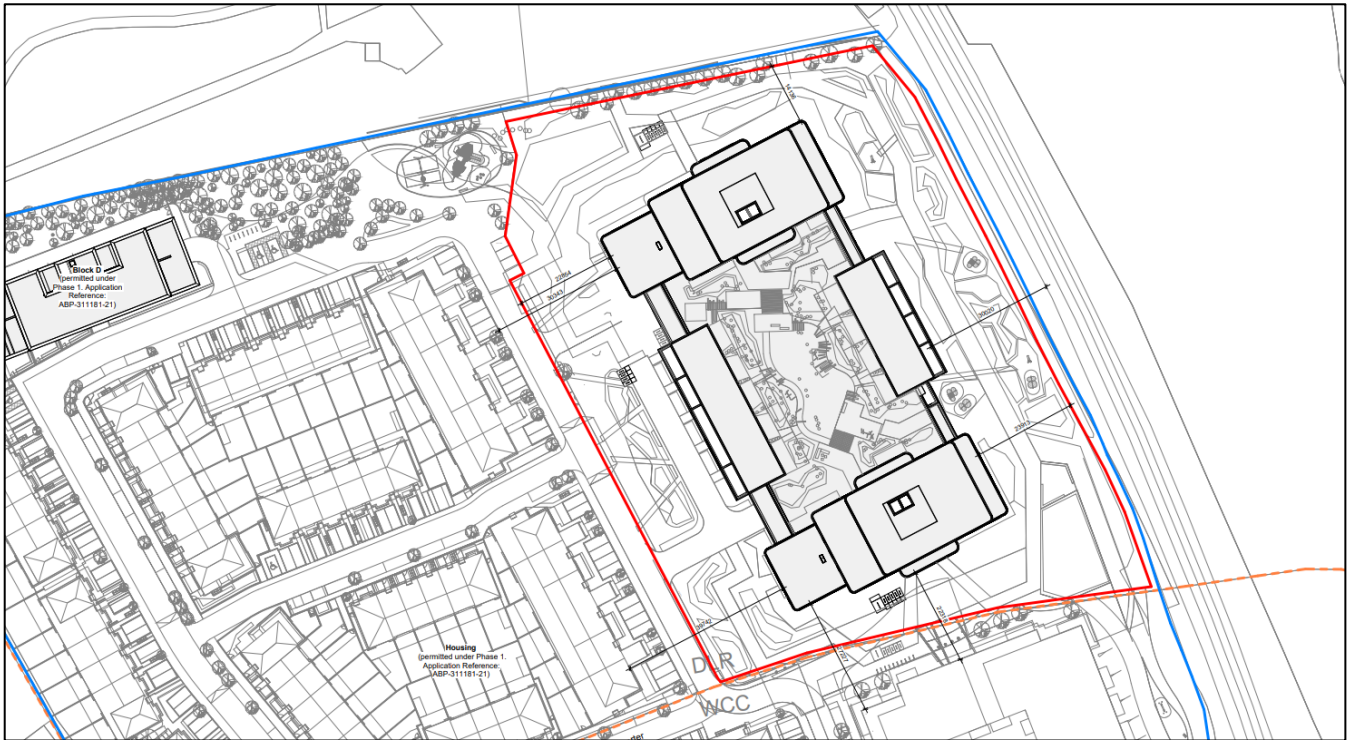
Sea Gardens Phase1 Block A Site Layout Plan
